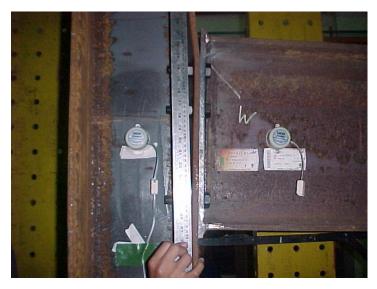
Failure mode of the column flange (FEP 3 connection).
